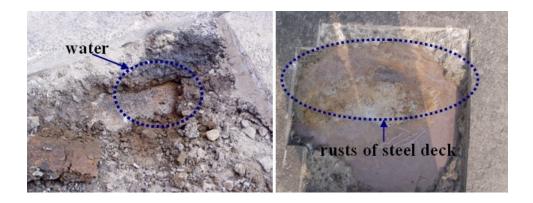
Water remaining in the pavement and rust of the steel deck on NSYSB.
